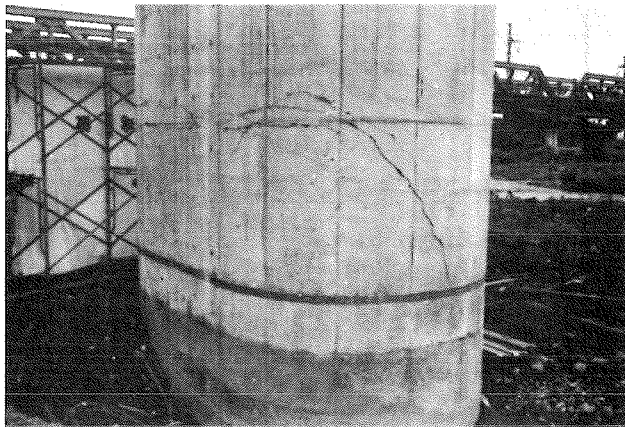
Pier of 4-span Continuous Prestressed Concrete Bridge
